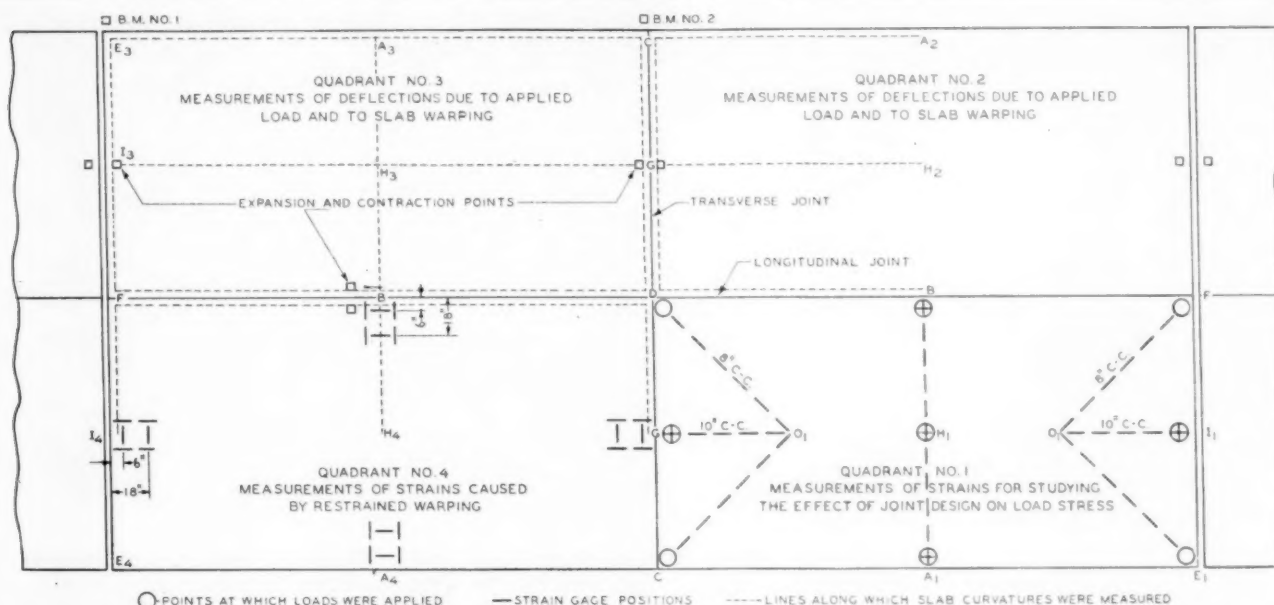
PLAN OF A 20 BY 40-FOOT TEST SECTION SHOWING THE POSITIONS OF THE APPLIED LOADS AND OF THE MEASURING INSTRUMENTS FOR THE STUDY OF JOINT BEHAVIOR. MEASUREMENTS OF DEFLECTIONS IN QUADRANTS 2 AND 3 WERE MADE WITH LOADS APPLIED TO QUADRANT 3 AT LOAD POSITIONS CORRESPONDING TO THOSE INDICATED BY CIRCLES IN QUADRANT 1.
